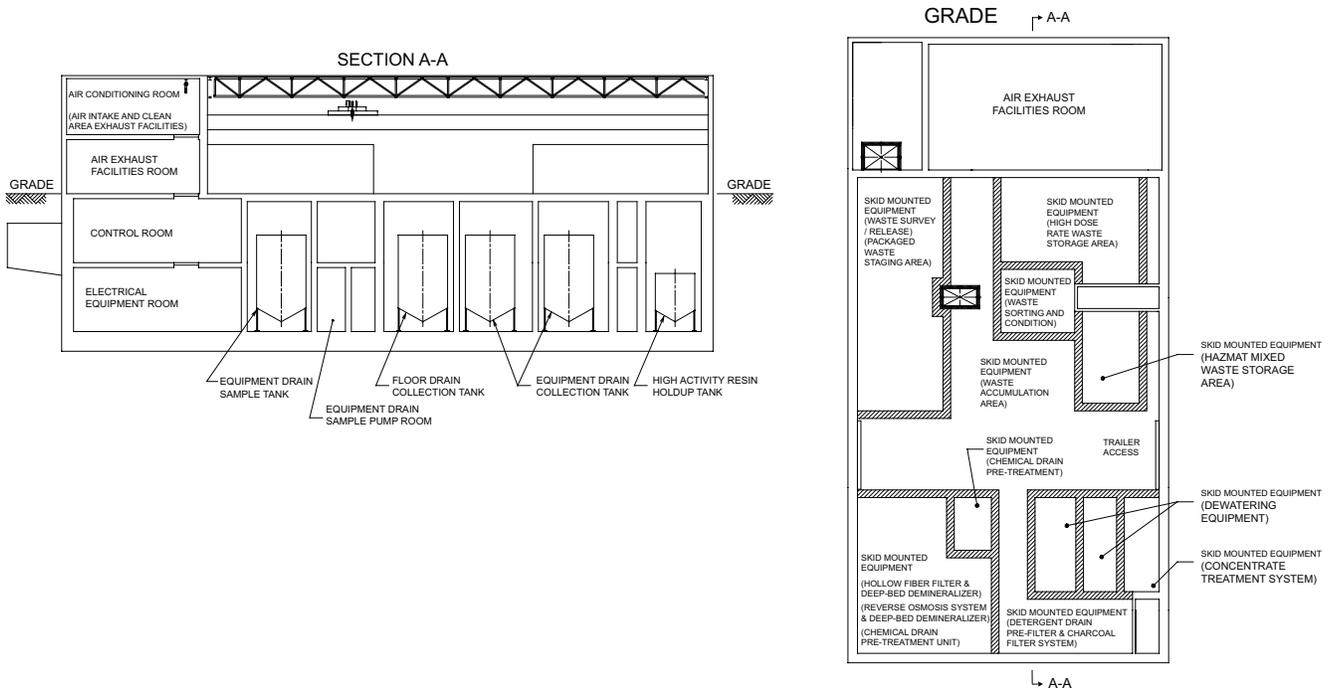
ESBWR Radwaste Building Section and Grade Elevation
